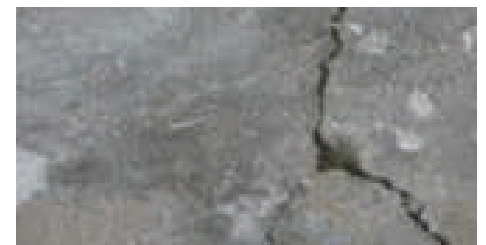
Concrete building cracking due to poor construction practice; water added to fresh concrete.
